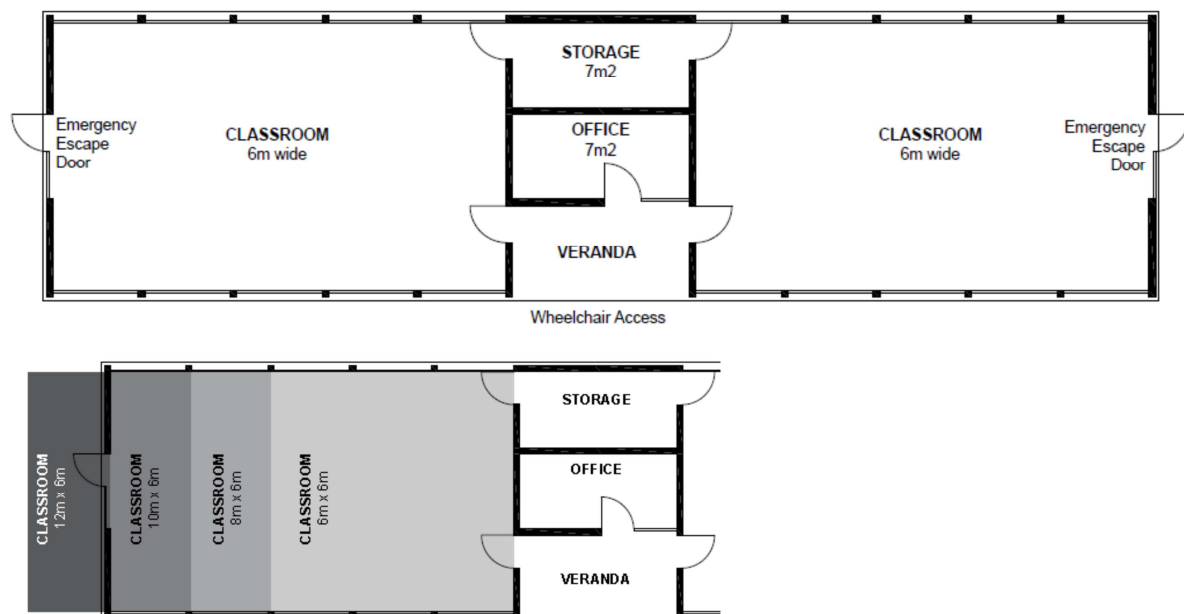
Hybrid Building Floor Plan (Source: Kaunitz 2011)
